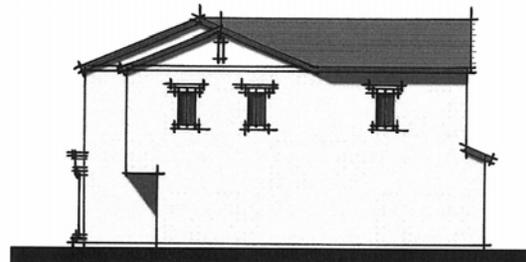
Plan 4 – Colonial Elevations
